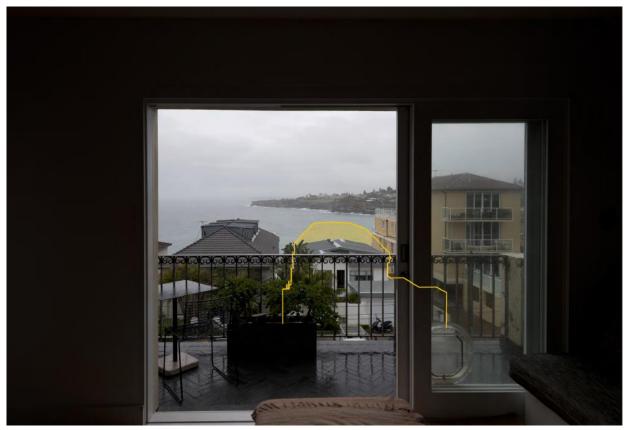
View from the living room of the unit on the second floor showing the outline of the proposed built form. View is from a standing position
